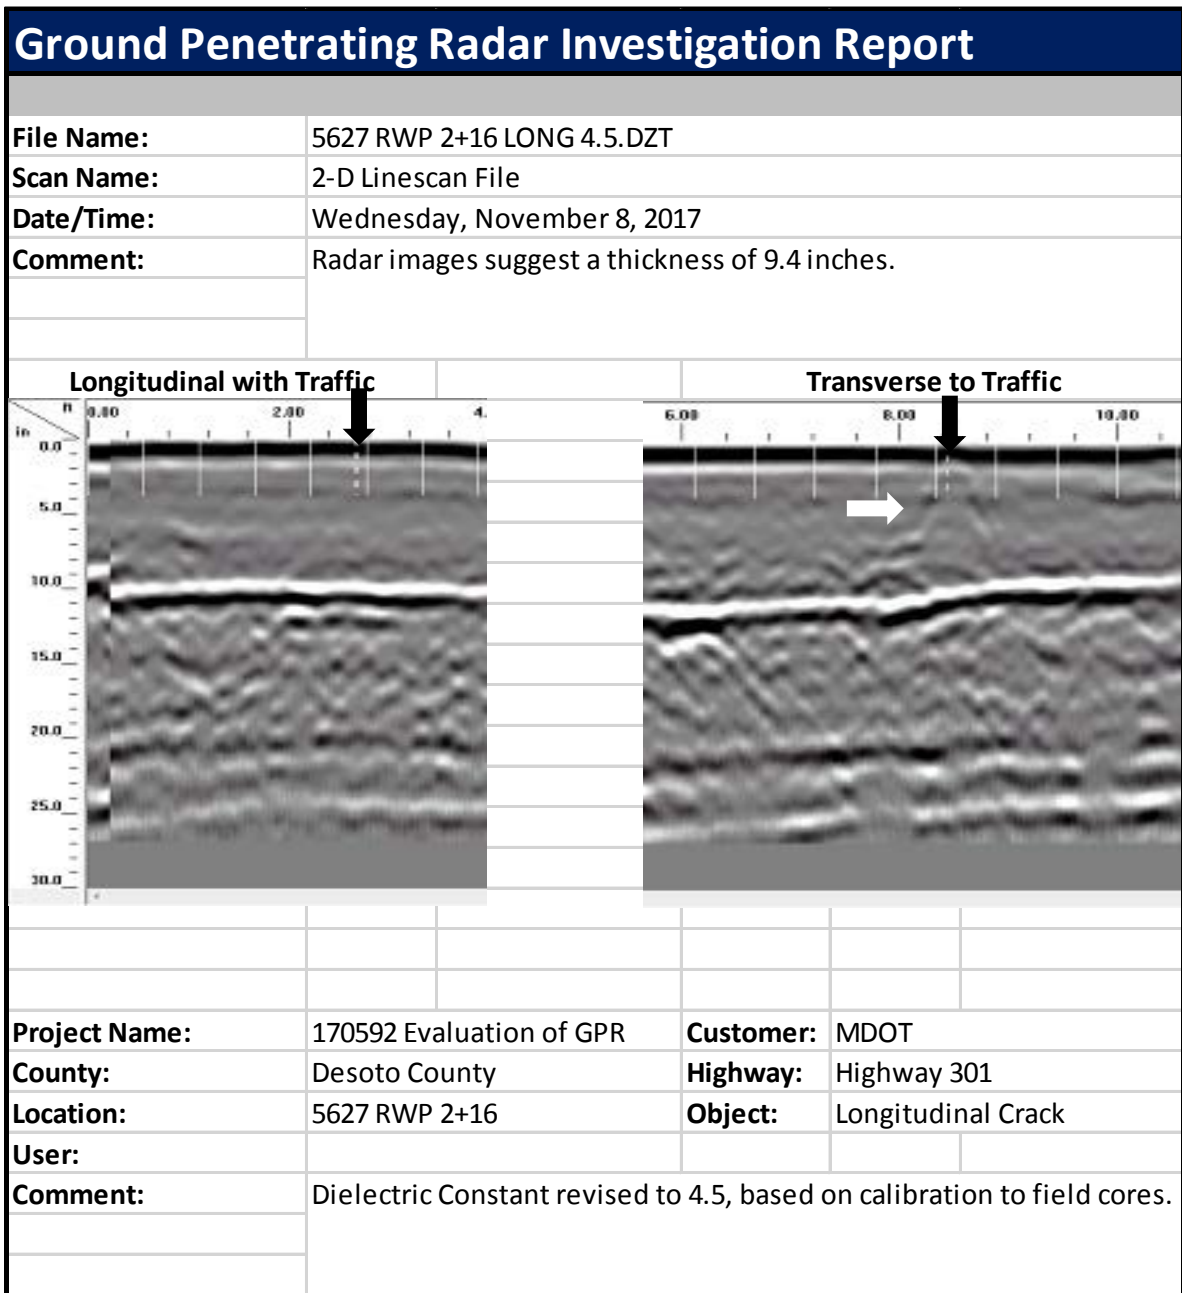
GPR Traces for Longitudinal Crack - Section 5627, Station 2+16
